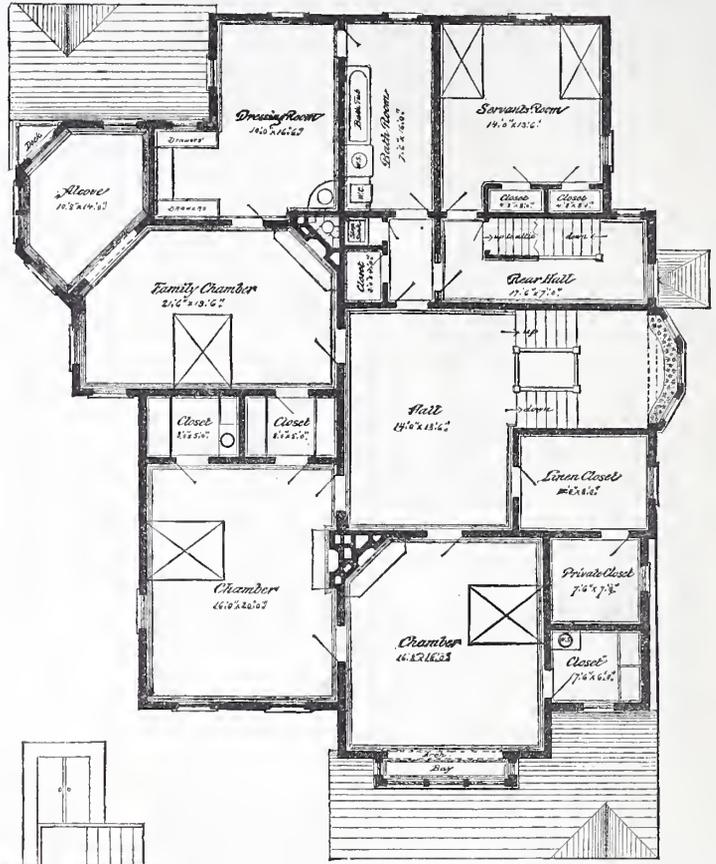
Second Floor Plan, by "Convenience."—Scale, 1-16 Inch to the Foot.
